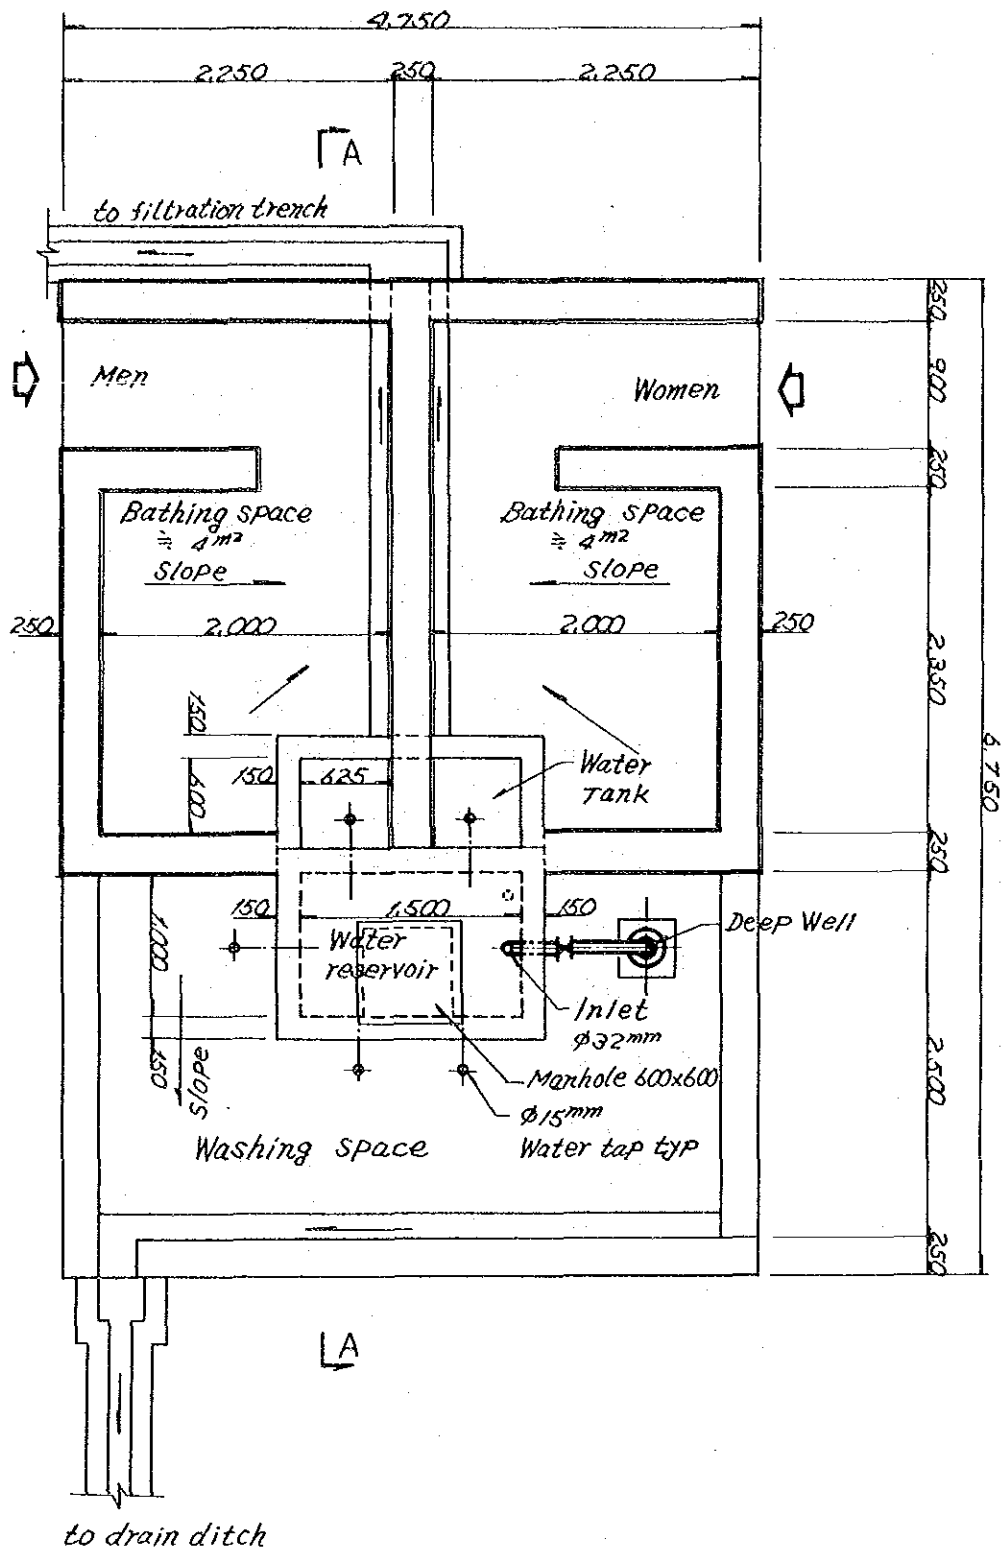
TYPE - B FACILITY-PLAN S=1/50
